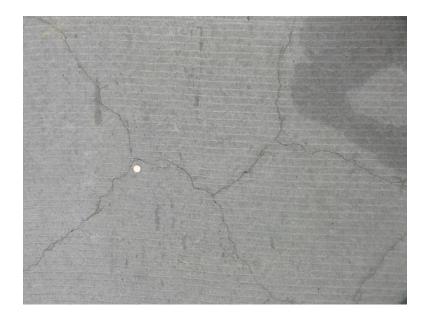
Cracking in 8200 South northbound conventional concrete deck at 1 year.
